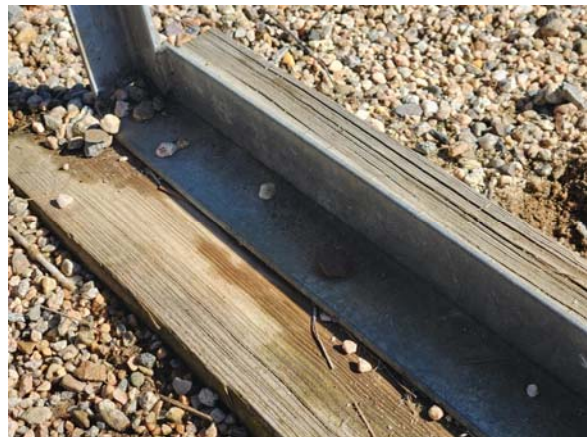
Bleacher structure timber foundation and gravel subbase.
